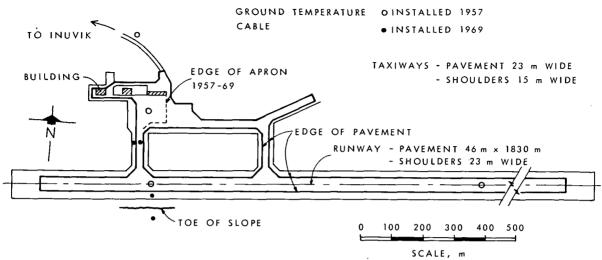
Plan showing general layout of the Inuvik, N.W.T., airstrip.
